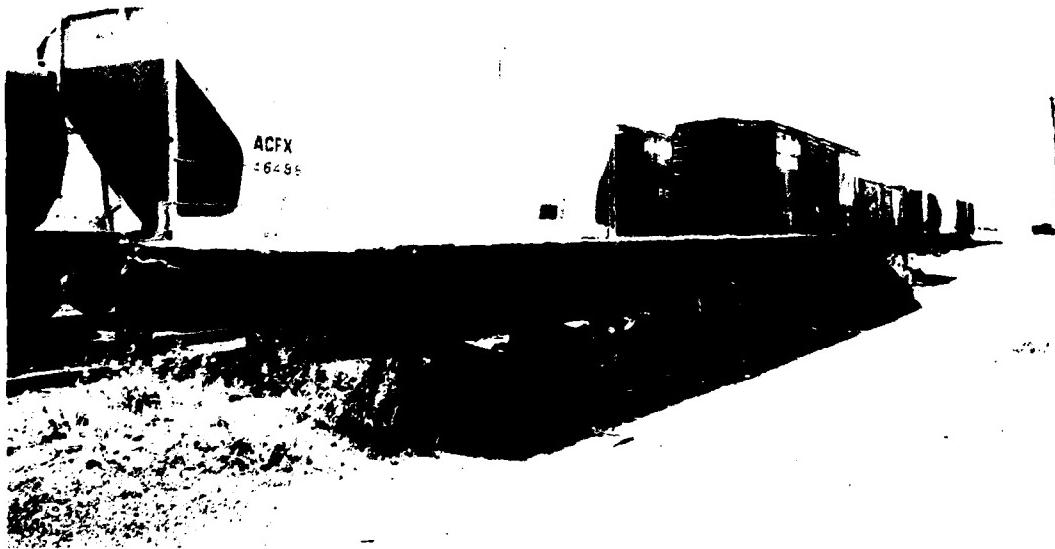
Side-loading ramp, Massey Yard, Watertown, New York.
